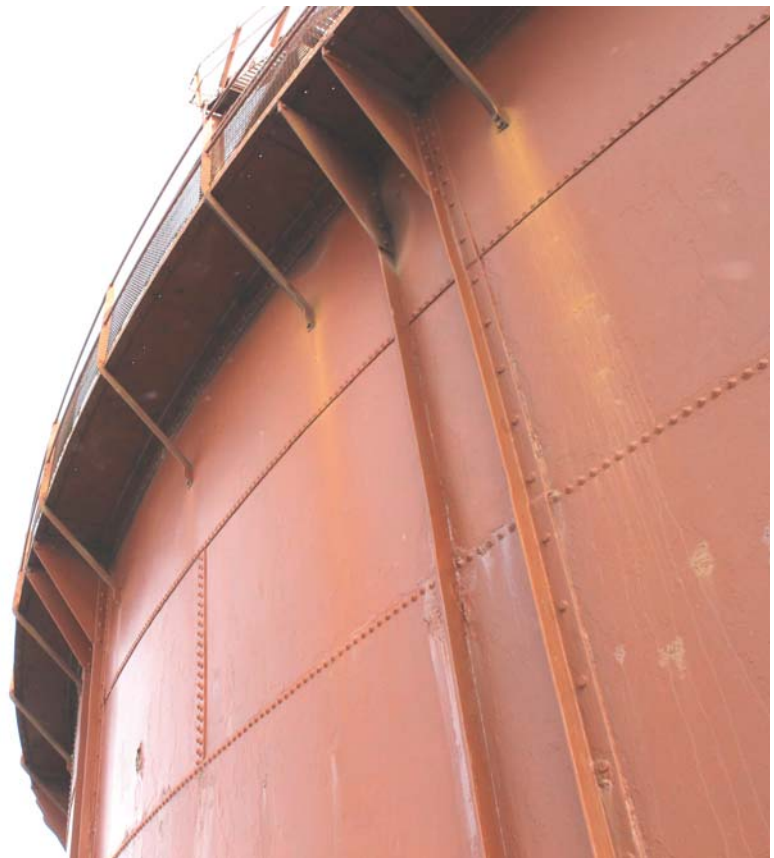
Sea Street, Herne Bay, detail of the upper walkway from the south-west
